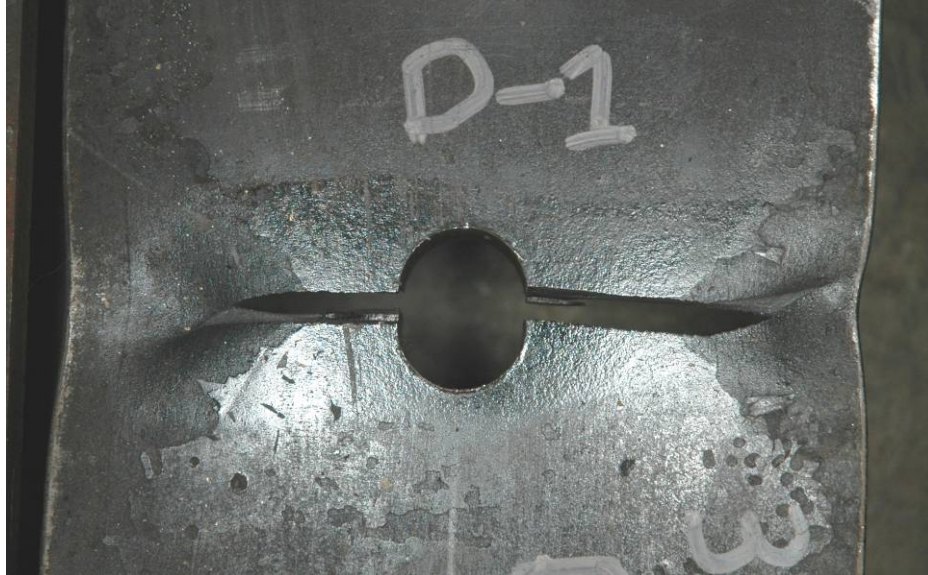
Typical Crack Orientation for Specimens with Bolted Gusset Plate (Specimen D-1).
